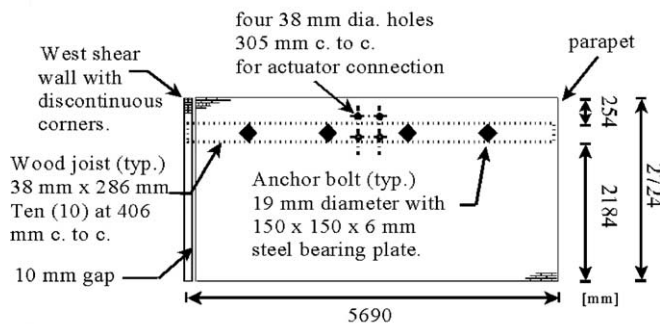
Elevation of URM specimen (normal to loading): south wall.
